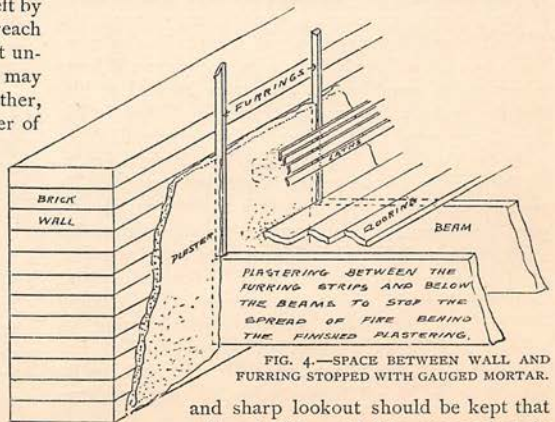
SPACE BETWEEN WALL AND FURRING STOPPED WITH GAUGED MORTAR.
